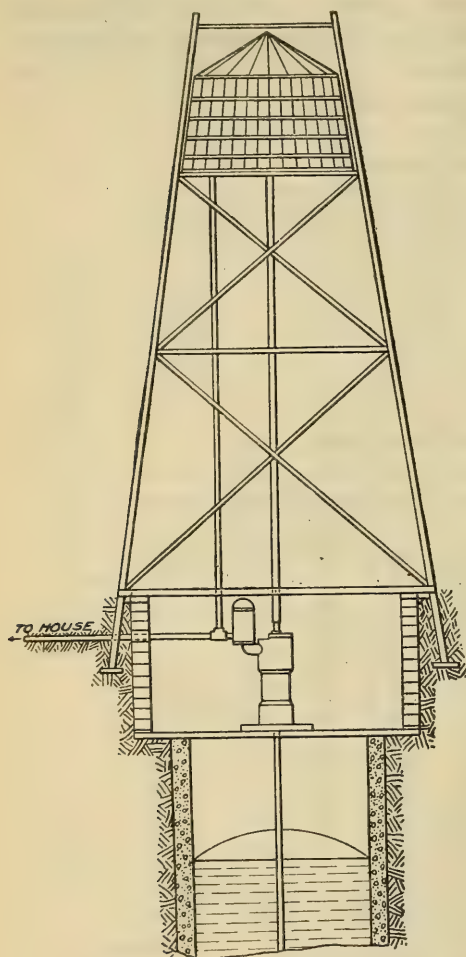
Gravity supply system with storage tank on windmill tower.
